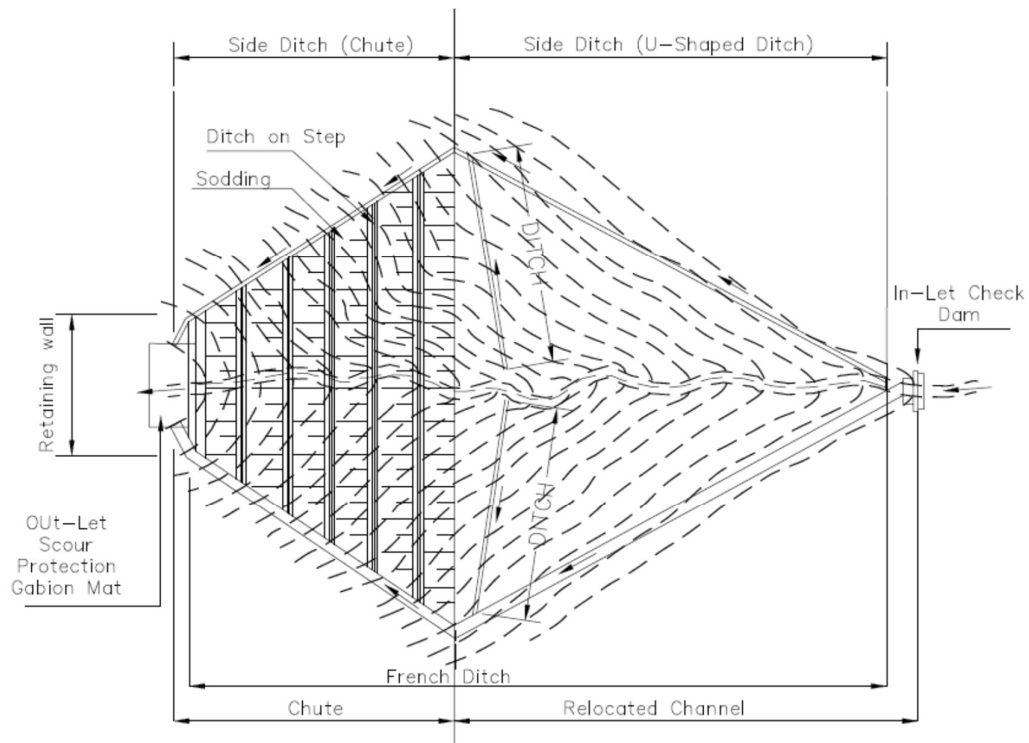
(a): Typical Arrangement for Spoil Banks: Plan
